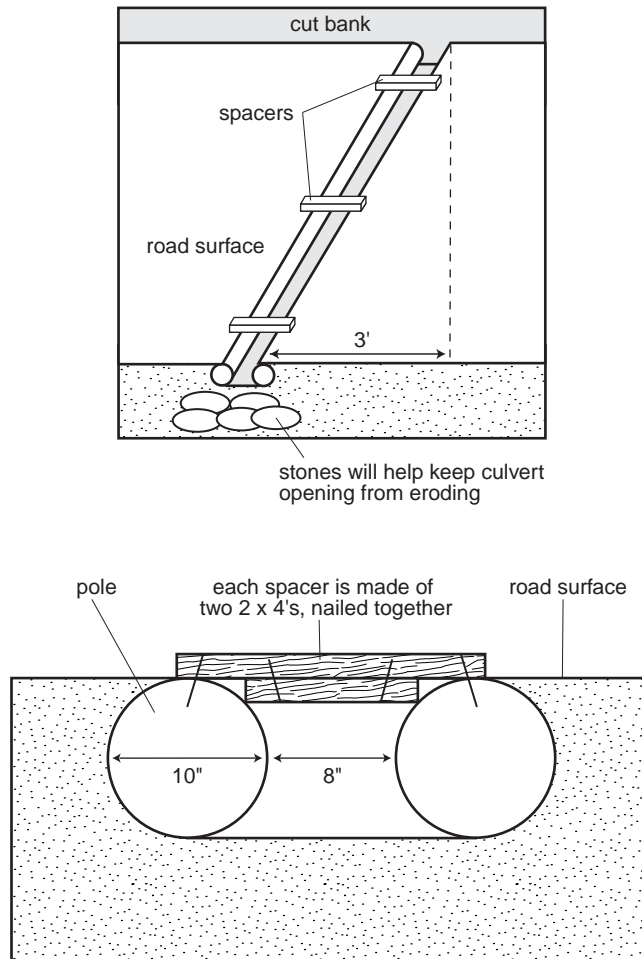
Cross-Sectional View of a Closed Culvert.
